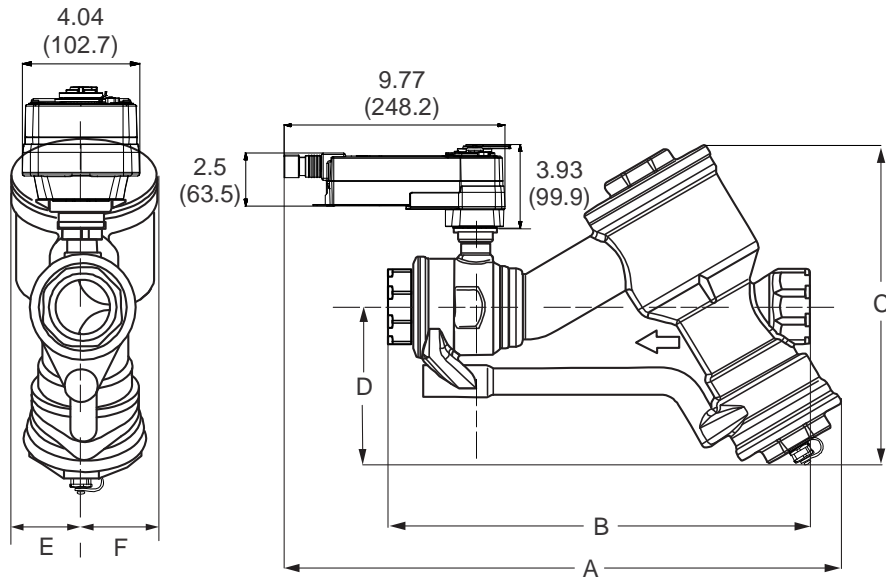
VA2220 Actuated P1000 Pressure Independent Valve without Pressure Taps Dimensions, in. (mm)
